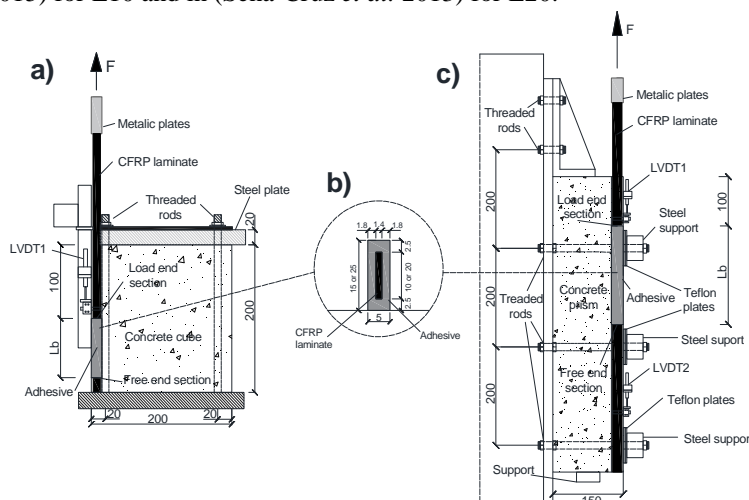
Geometry of specimens and test configuration: (a) cubic concrete specimen (axial cross-section); (b) groove detailing; (c) prismatic concrete specimen (axial cross-section).
